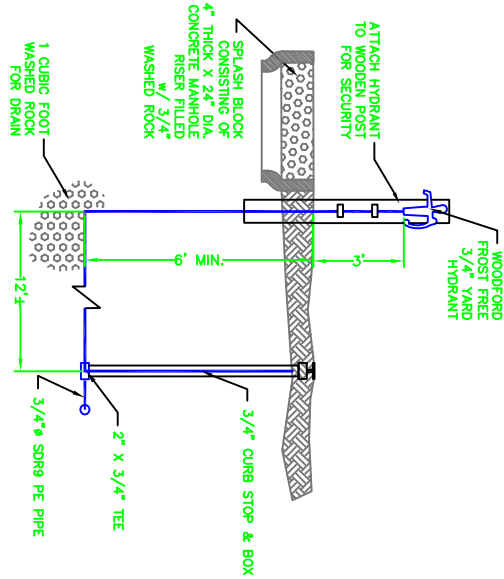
CONNECTION TO EX. SERVICE LINE
